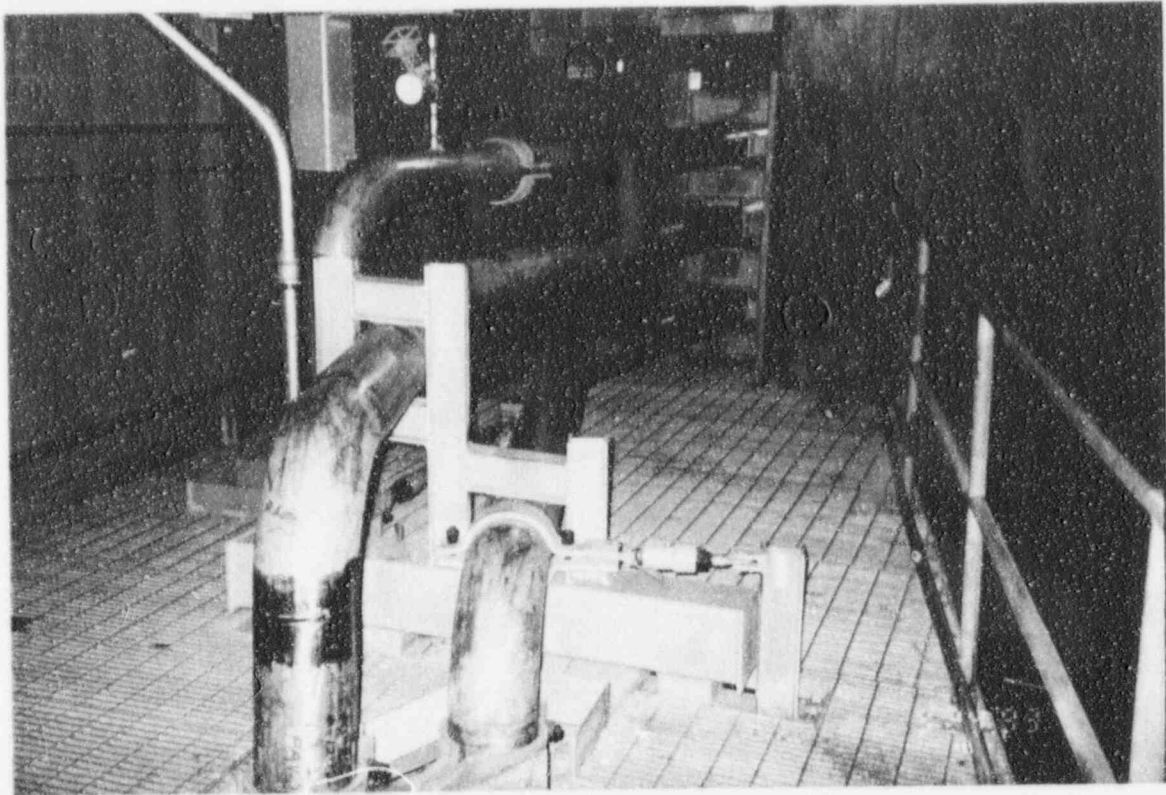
Typical HVAC Damper and Ducting Support
